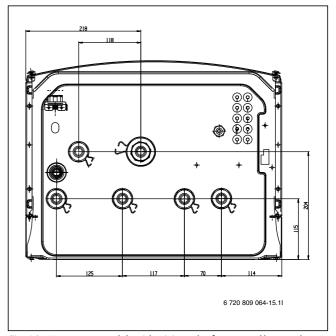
Heat pump module with mixing valve for external booster heater dimensions in mm
